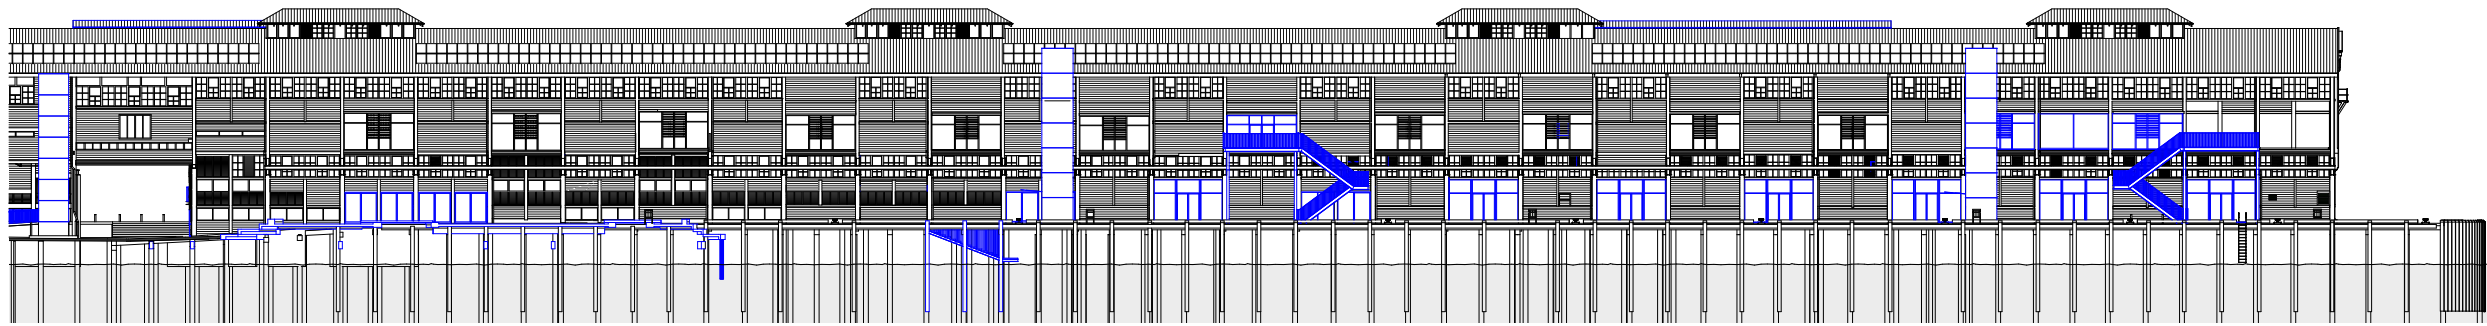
Proposed East elevation Wharf 4/5, (alterations shown in blue).
